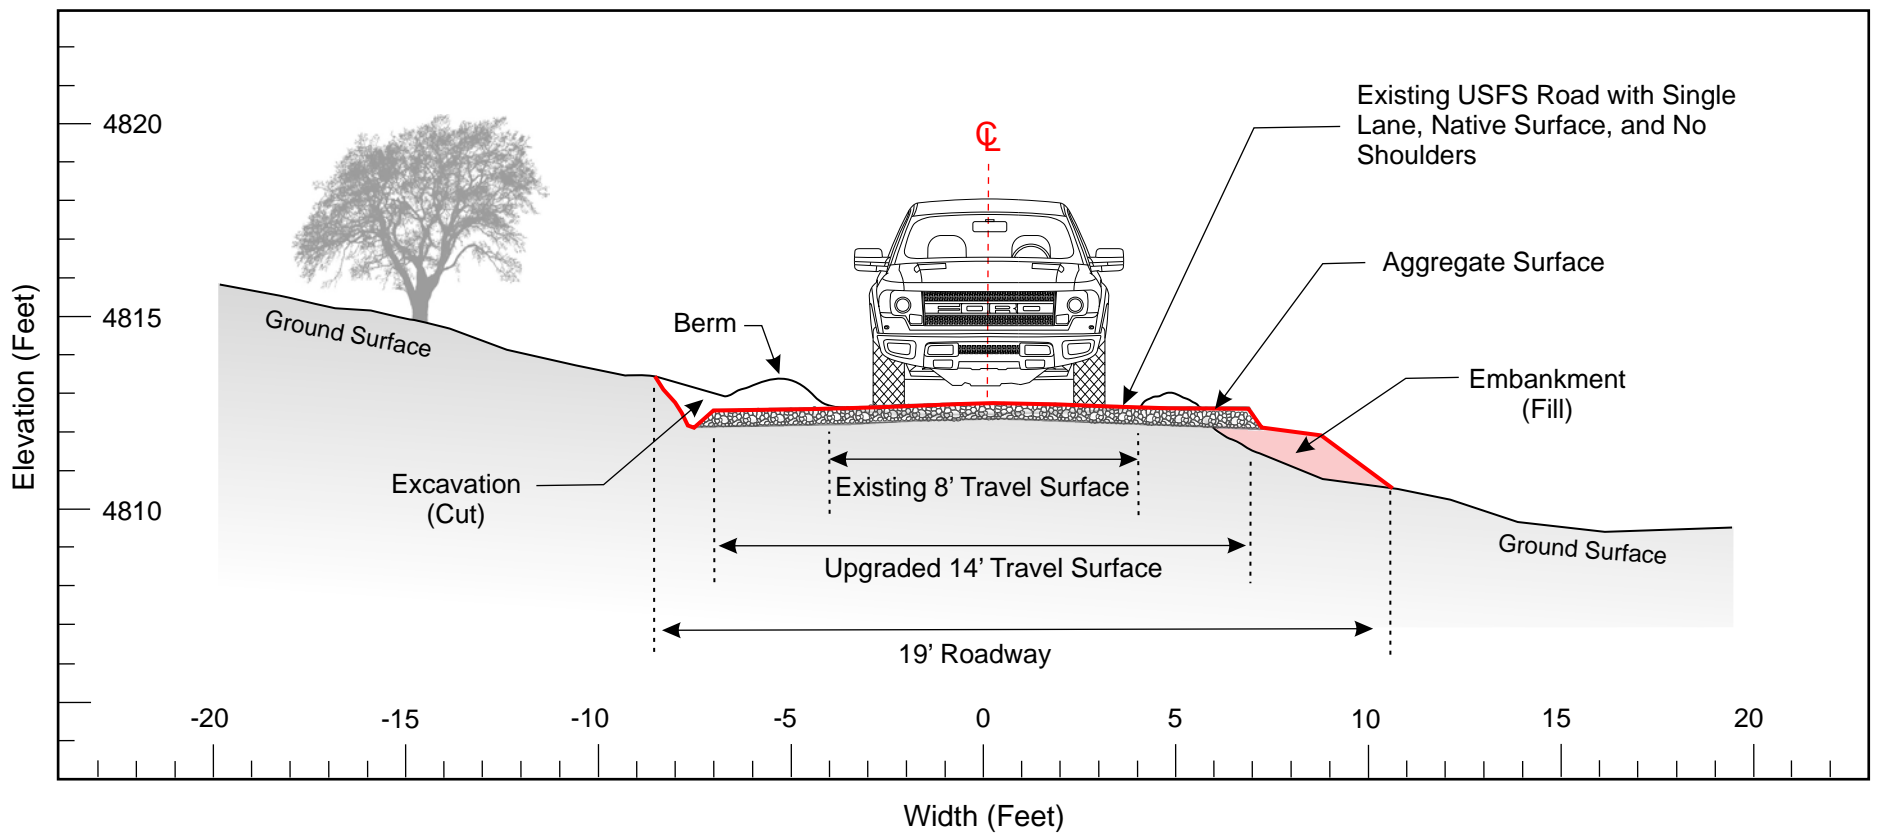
Cross-Section of Typical Upgraded Narrow-Width Road
